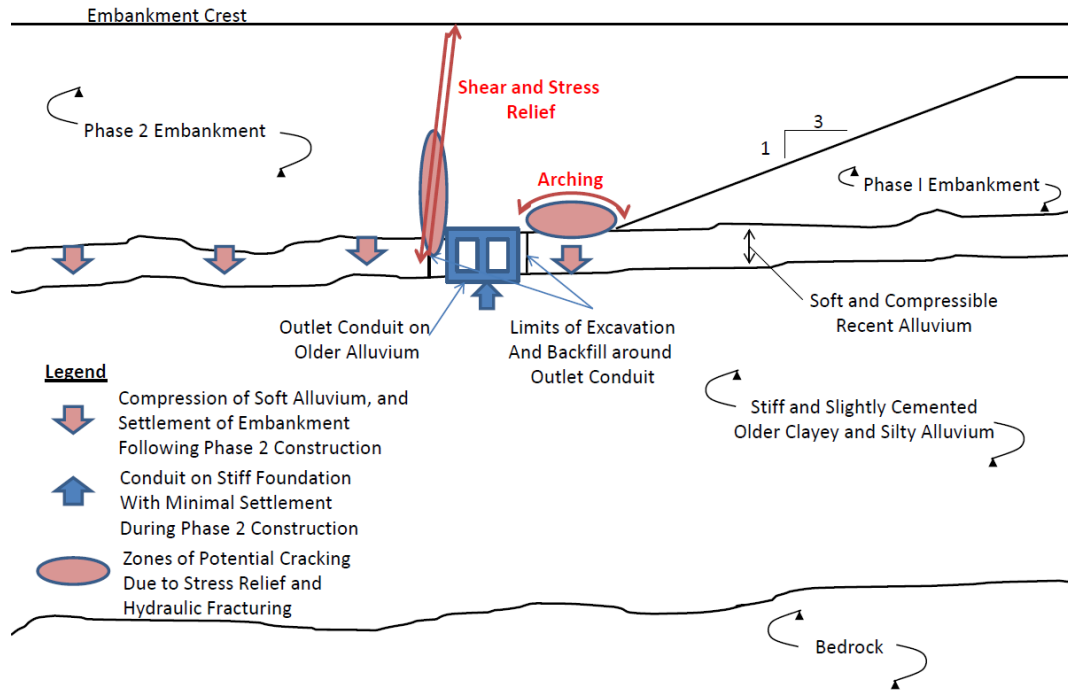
Locations where Cracking and Hydraulic Fracturing Could Develop Around an Outlet Conduit
